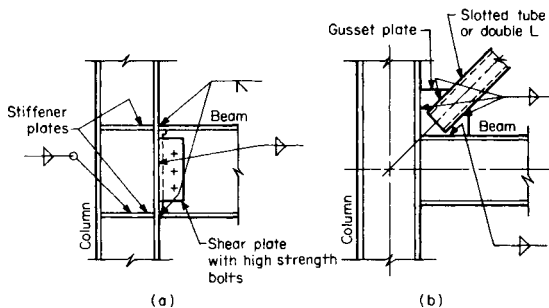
Welded connections. (a) Moment connection; (b) bracing connection.
